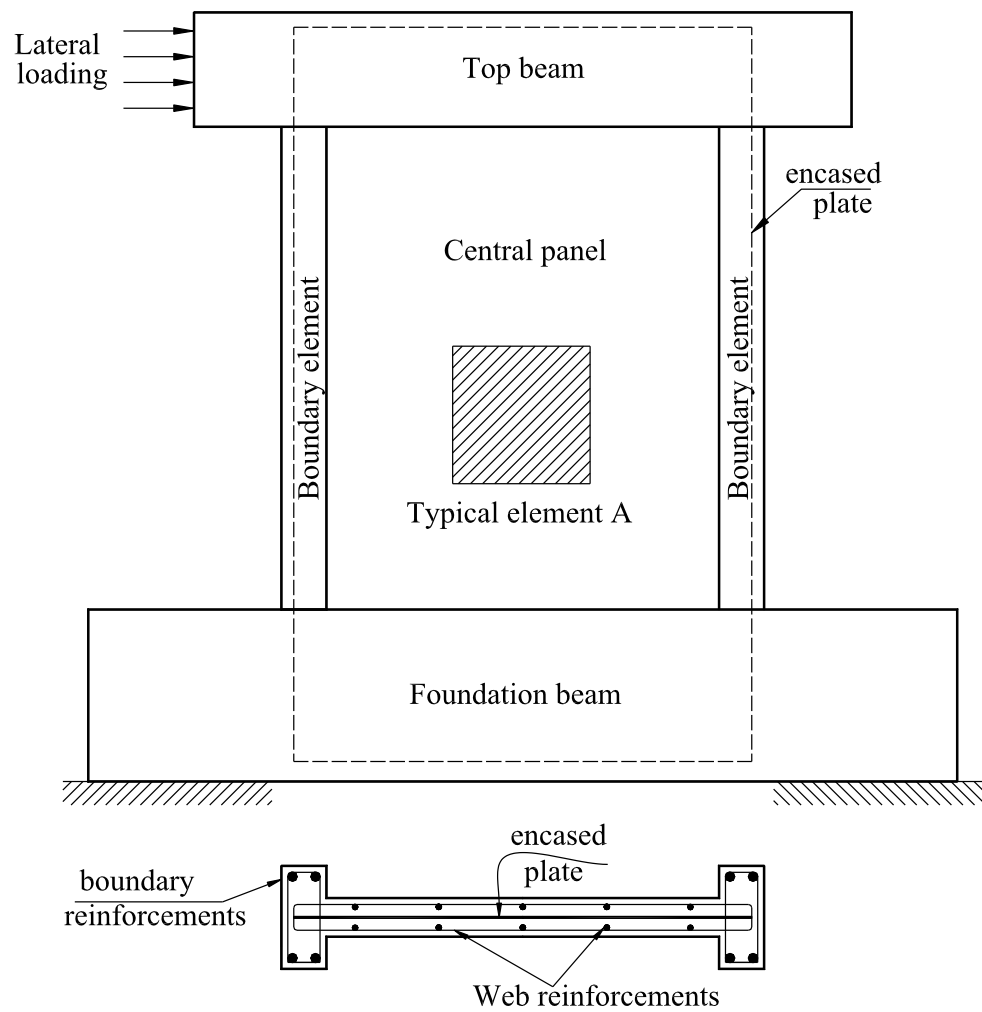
View of a typical encased-plate composite structural wall system with an isolated element
